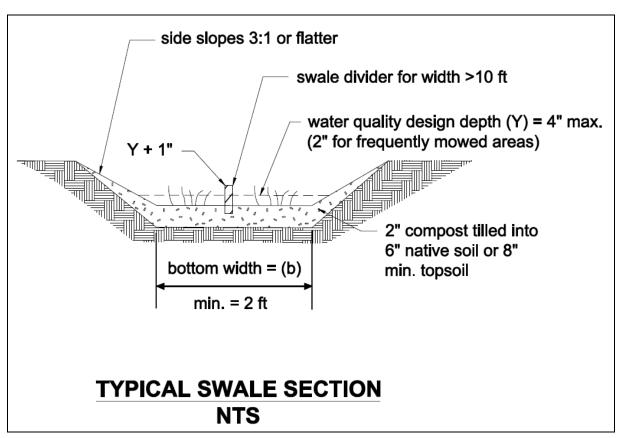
BMP RT.04 - Biofiltration Swale Section
